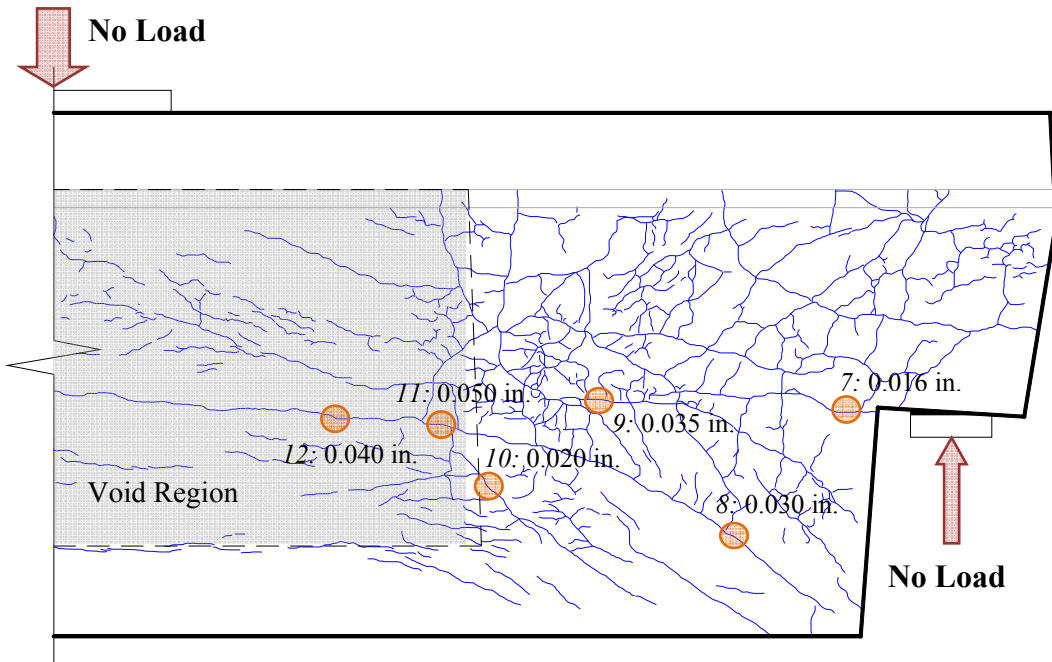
Pre-test cracking and crack widths due to ASR and DEF on the east side of the tested shear span of beam RF-3R-9(c).
